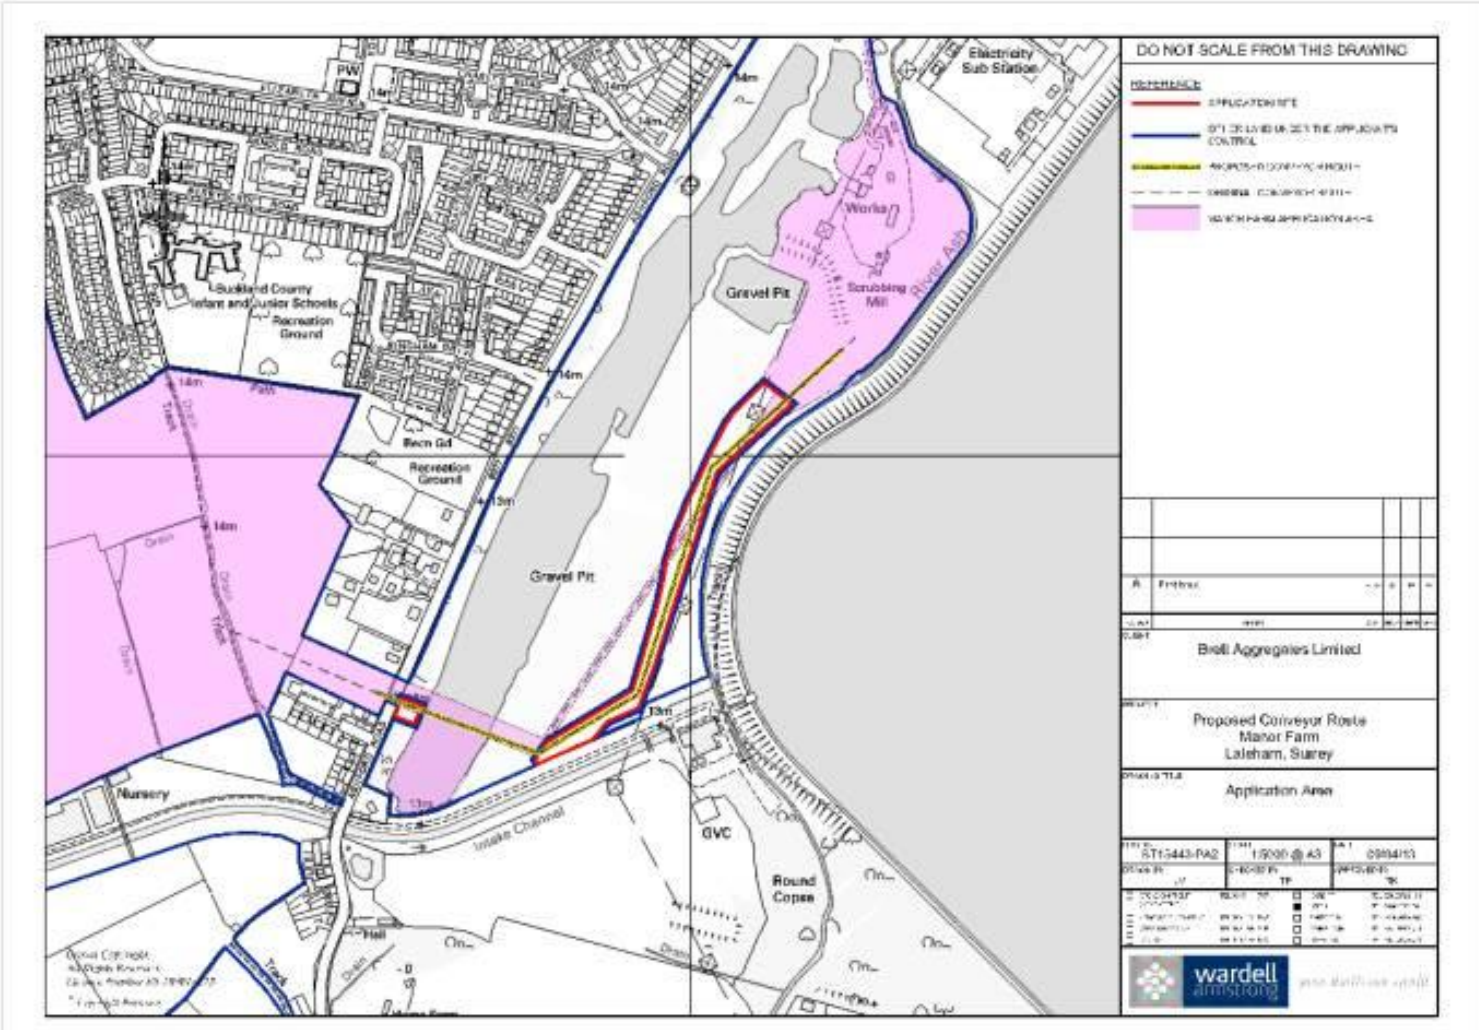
Planning application site showing proposed revised conveyor route within Queen Mary Quarry
